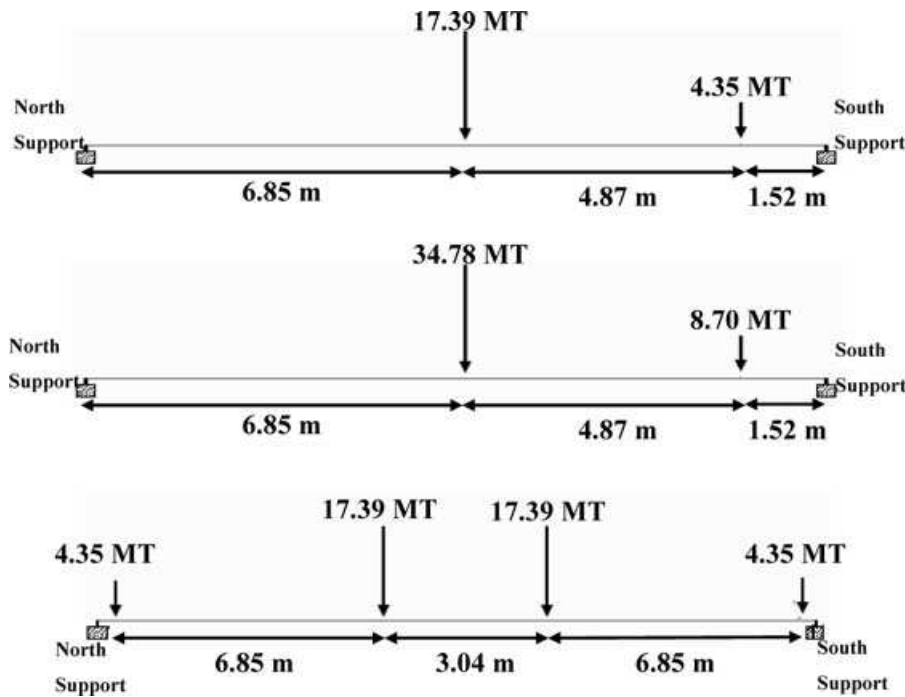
Bridge elevation view of the truck loading for each of the 13.85 m (45 ft) spans based on load cases corresponding to (a) Figures 7a–c, (b) Figure 7d, and (c) Figures 7e–g (MT: metric ton).
